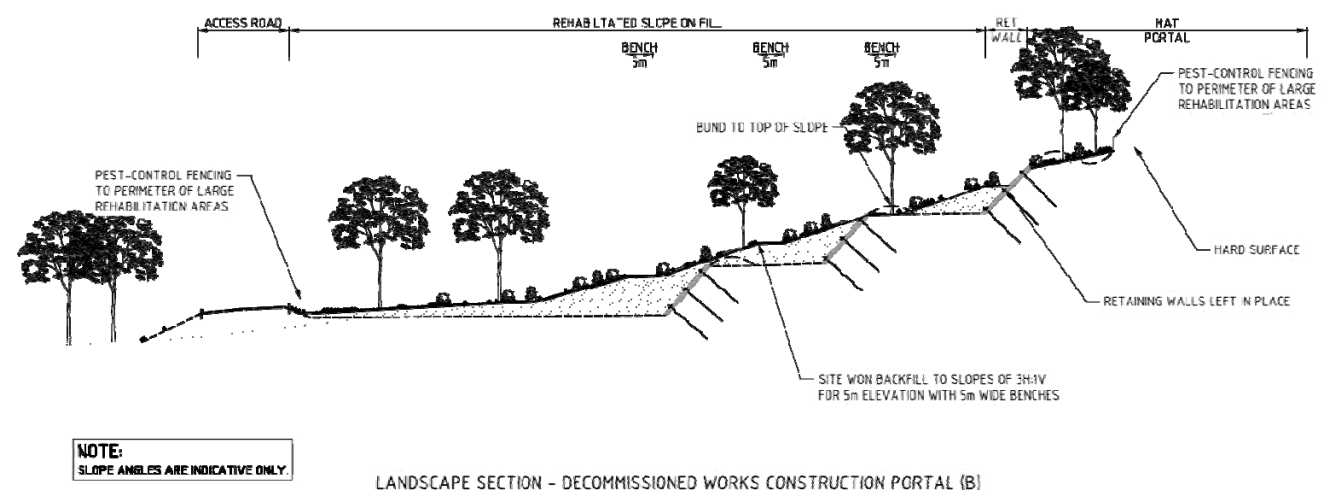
Typical section of the construction portal, rehabilitated once decommissioned
